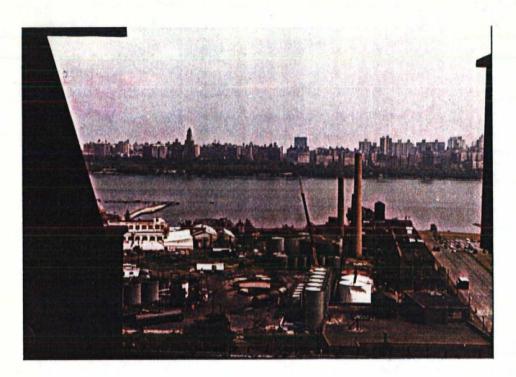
View of Site from Palisades; Railcar Loading, Tank Covering, Spencer-Kellog Tank Cutting. 8/8/85
